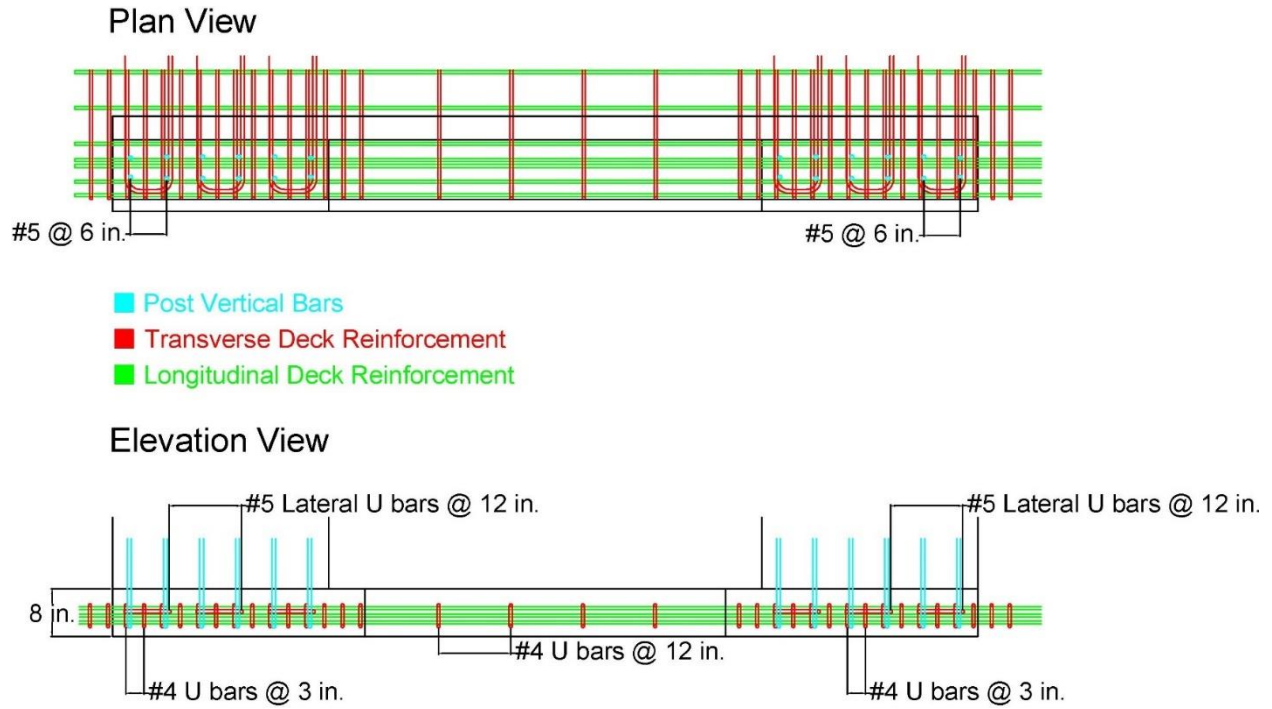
Option 1, Interior Post Deck Reinforcement, Plan and Elevation Views
